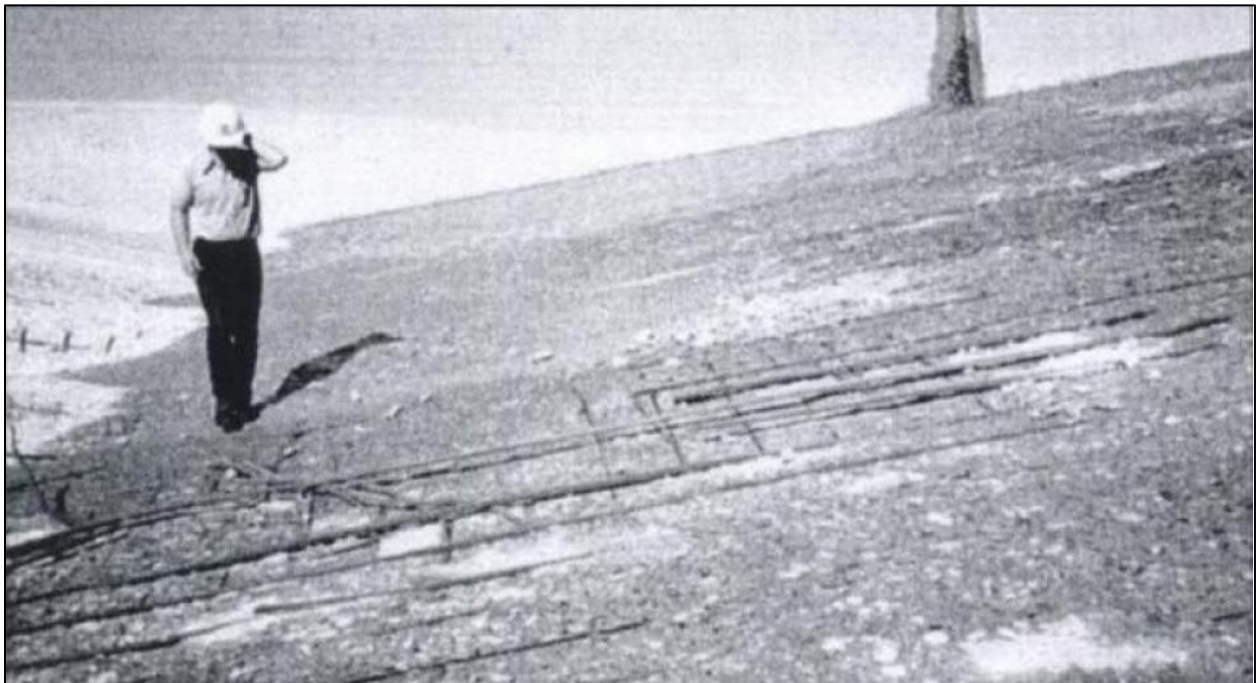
Cavitation damage at a spillway chute exposing the reinforcement of the hydraulic structure (Smoak, 1997)
